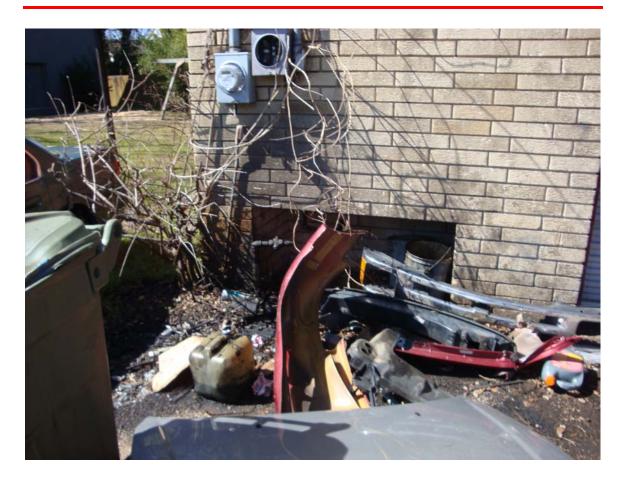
Oil stained concrete and debris on the southeast side of the building on the Subject Property. A container of used oil is visible on the ground on the left side of the picture. The recess in the building (compartment) most likely is used to hold a waste oil tank with fill port access from the inside of the building.
